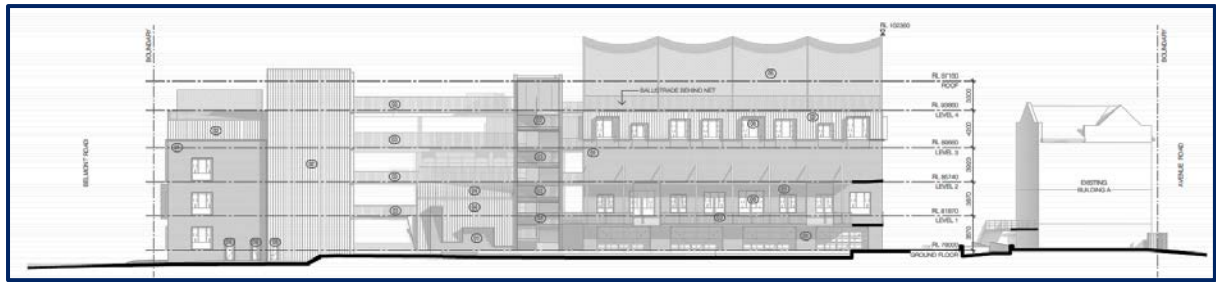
| Proposed Building G – western elevation (Source: Applicant's RtS, 2021)
